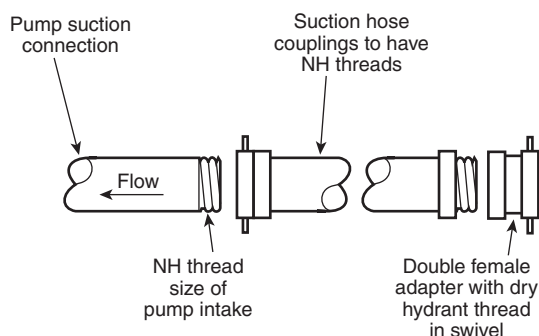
Intake Connections from Dry Hydrant to Pump.
